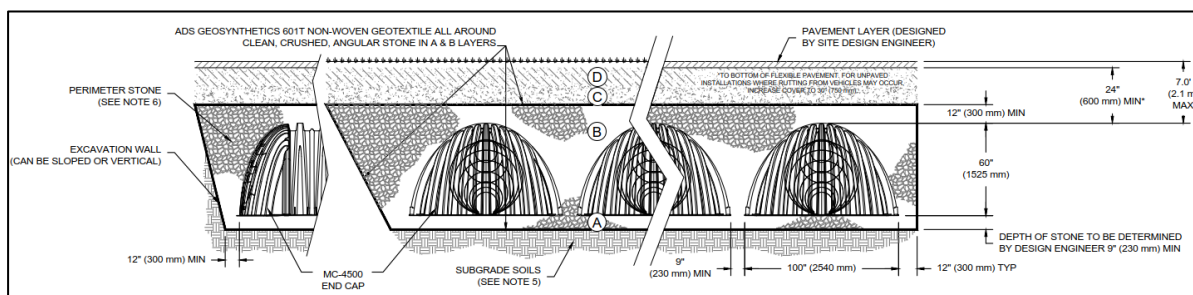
Stormtech Standard Detail (Extract from Stormtech MC-4500 Leaflet)
